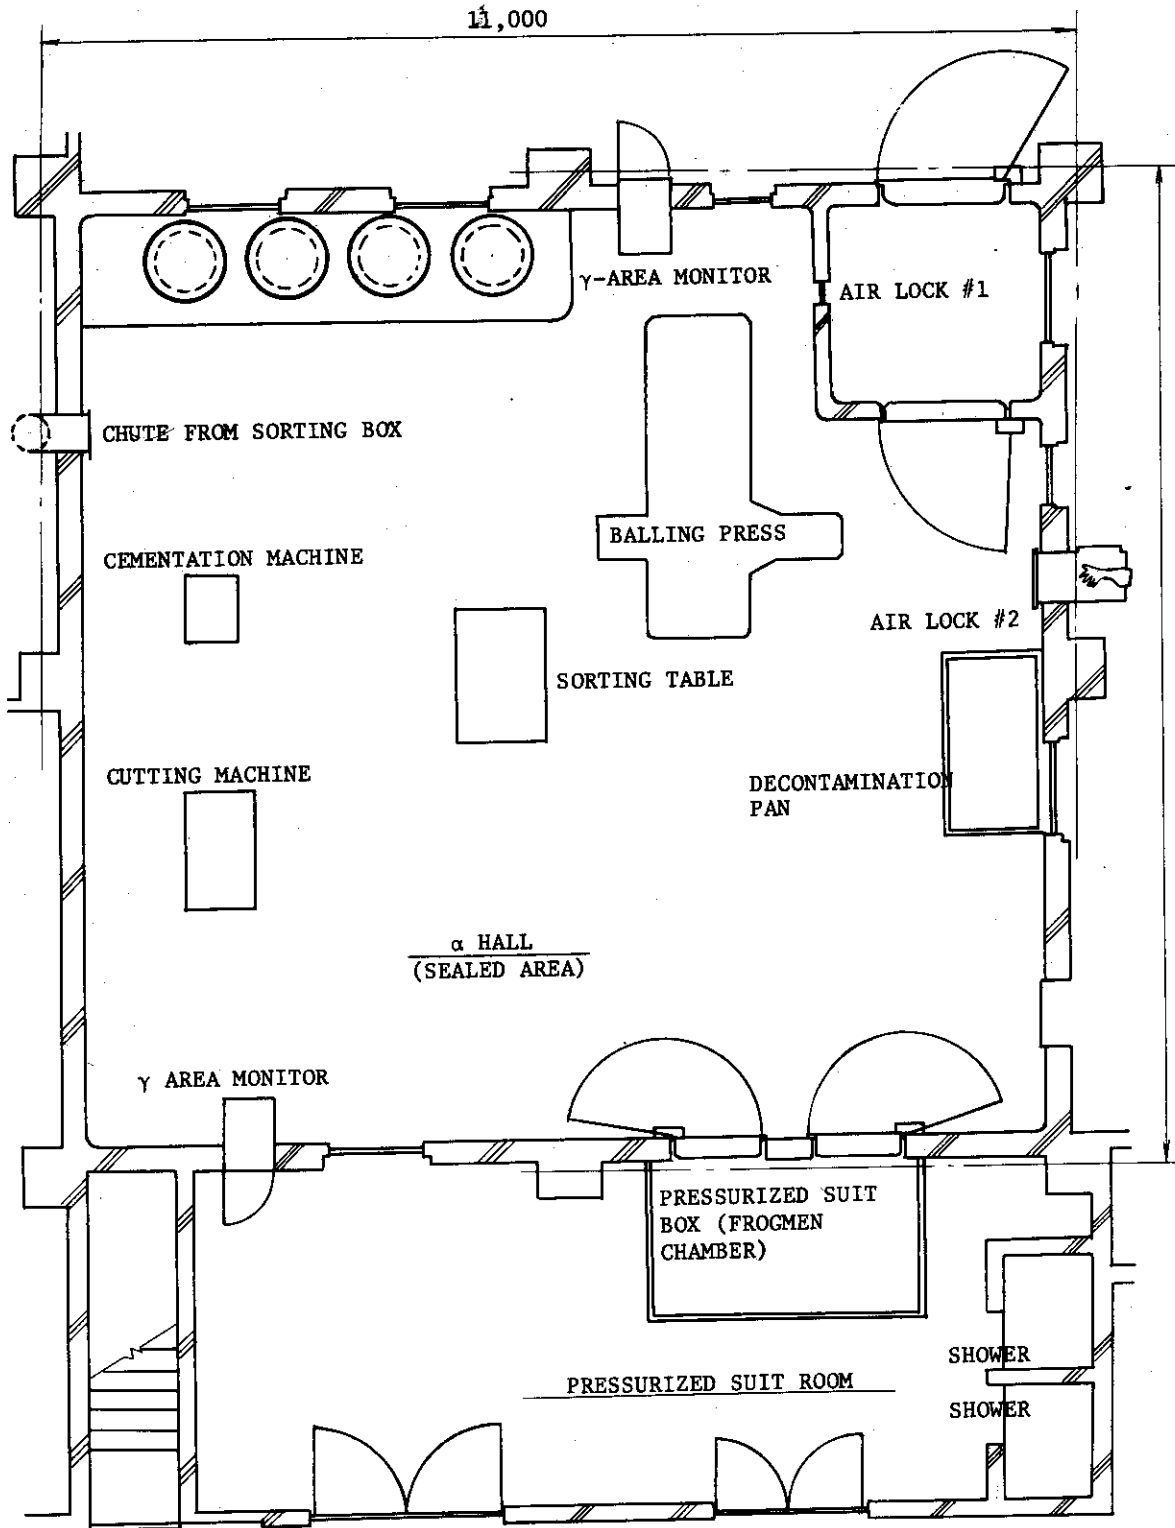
Layout of α -hall and surroundings.
